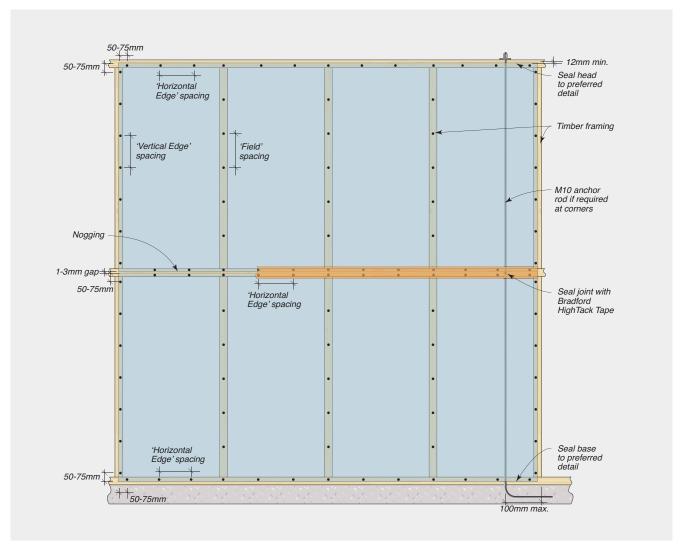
SHEET FIXING FOR STRUCTUAL BRACING - HORIZONTAL SHEETING\* - TIMBER FRAMING
